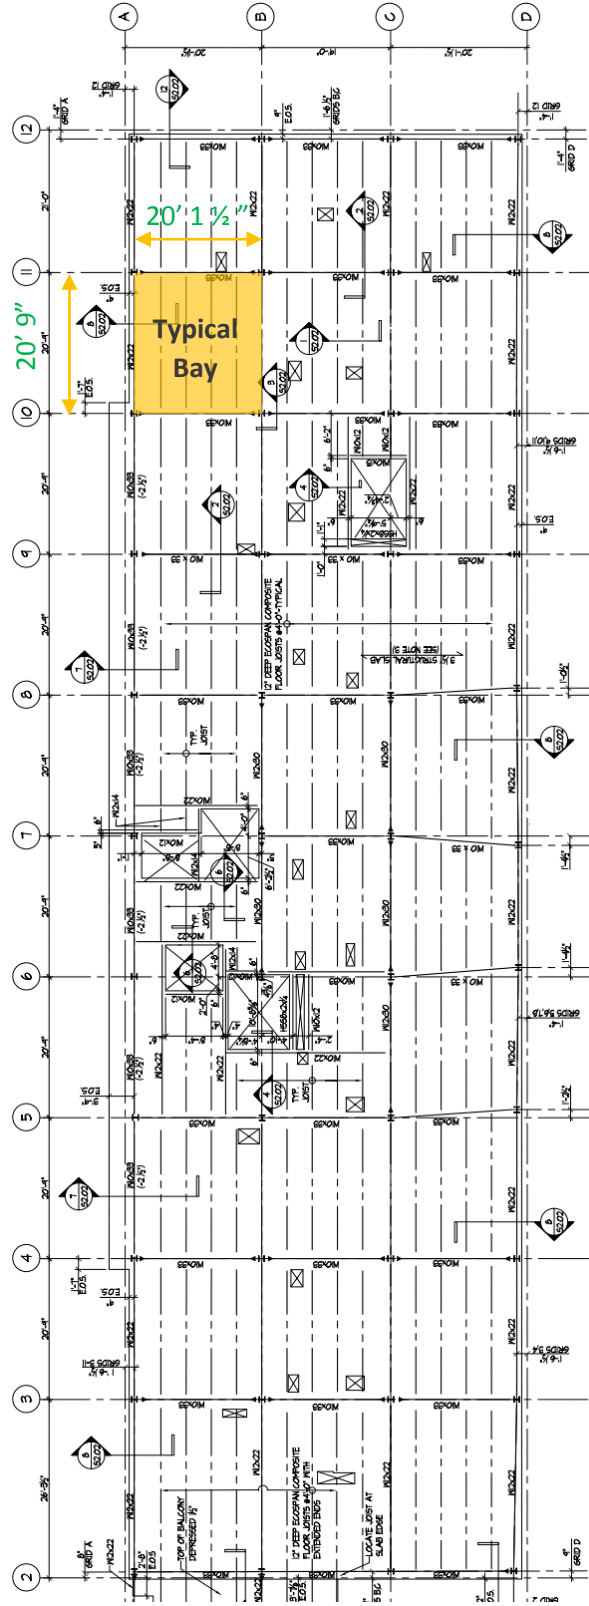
Typical Floor Plan, Grid in new steel floors matches original building's grid, S1.07
